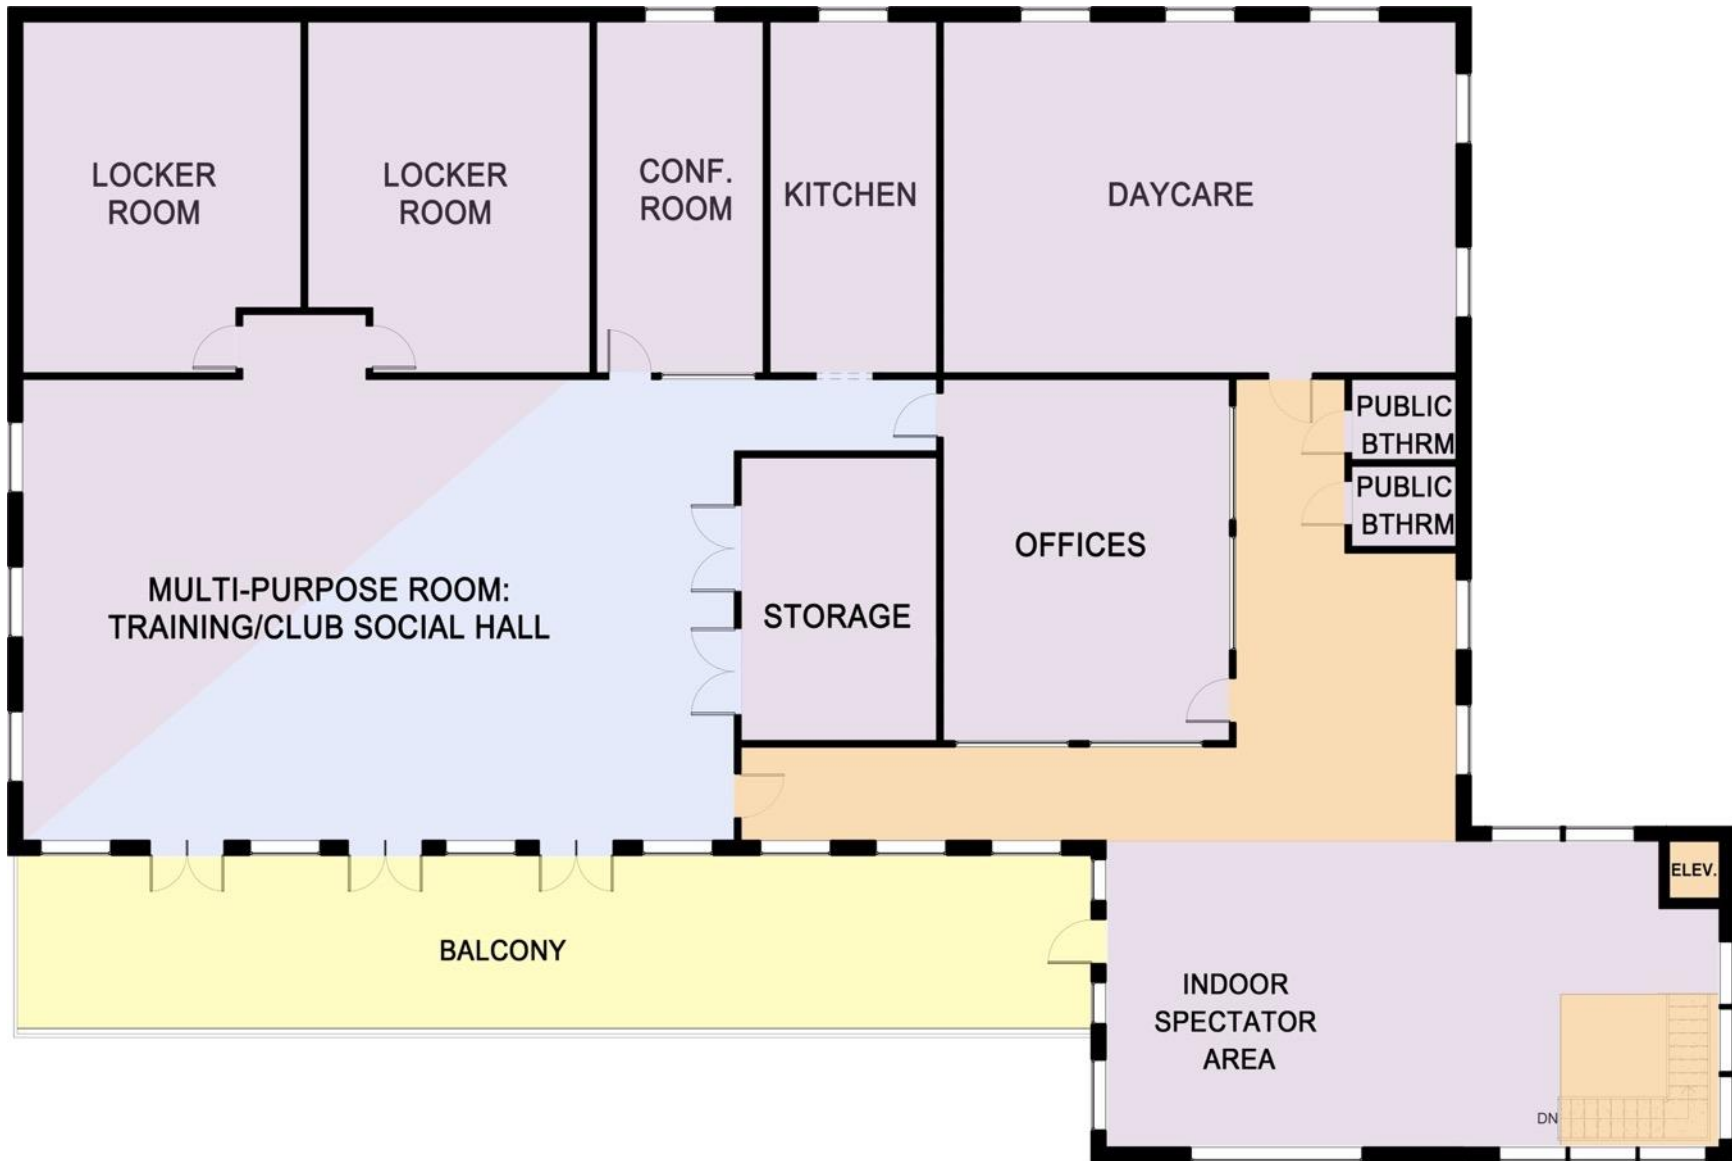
Enlarged Second Floor Plan (not to scale), source: author
